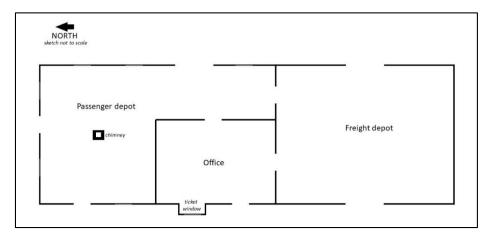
Sketch floor plan for the Havelock Station Depot (CV1137). Not to scale.
